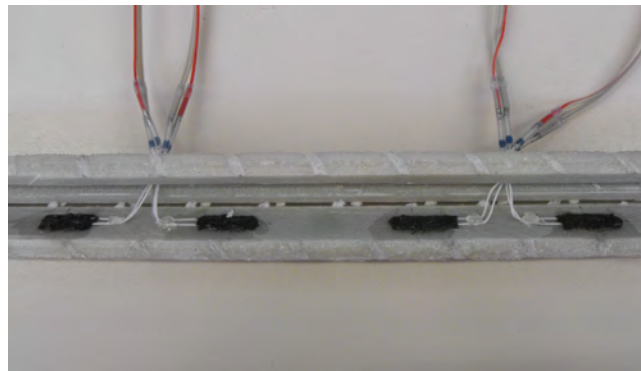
Two halves prepared to be glued together with protection on strain gauges and wires coming out through the drilled holes.
